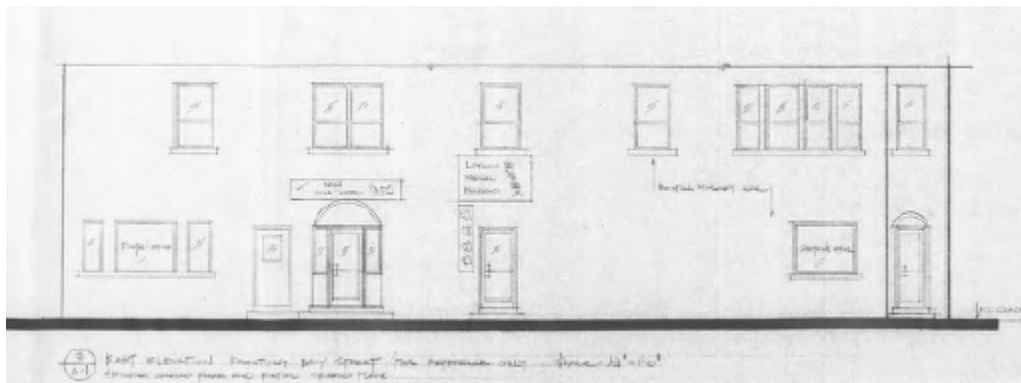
1980 architectural drawing showing openings on the first two storeys of the east elevation only. (Building Records)
